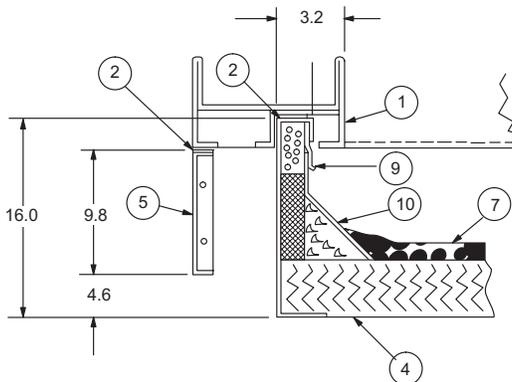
Roof Curb with Blank Compartment (Out of Airstream)
